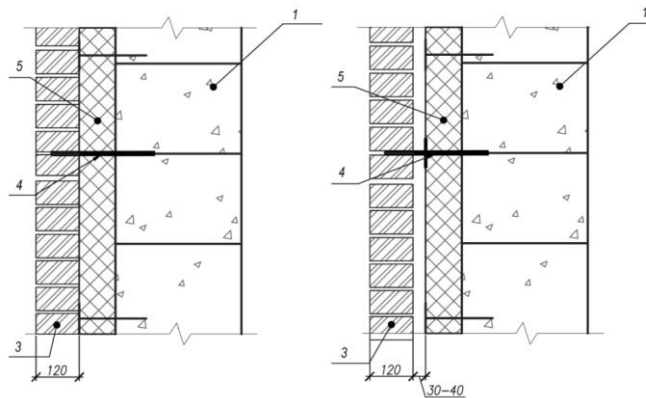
External walls types with autoclaved aerated concrete blockwork applying 1 – autoclaved aerated concrete blocks; 2 – joints; 3 – facing brickwork layer; 4 – flexible connections; 5 –thermal insulation
